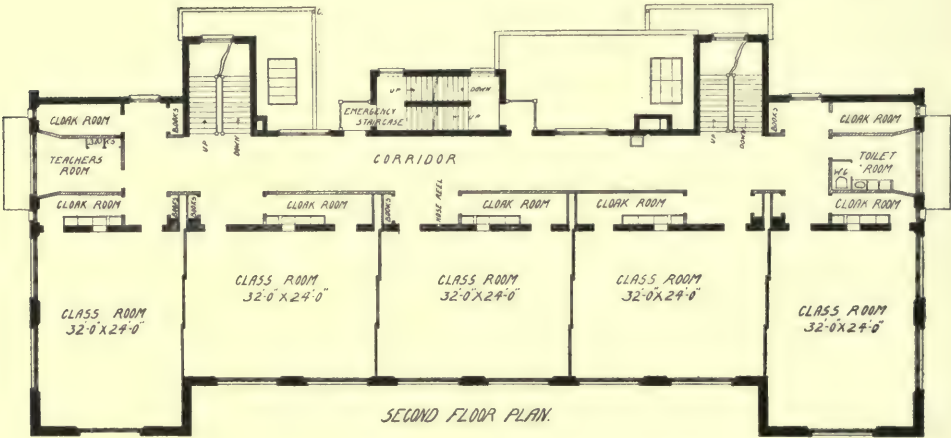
, 327, show the floors of the Bridgeport School. The sanitary block is placed in this case outside the building.
